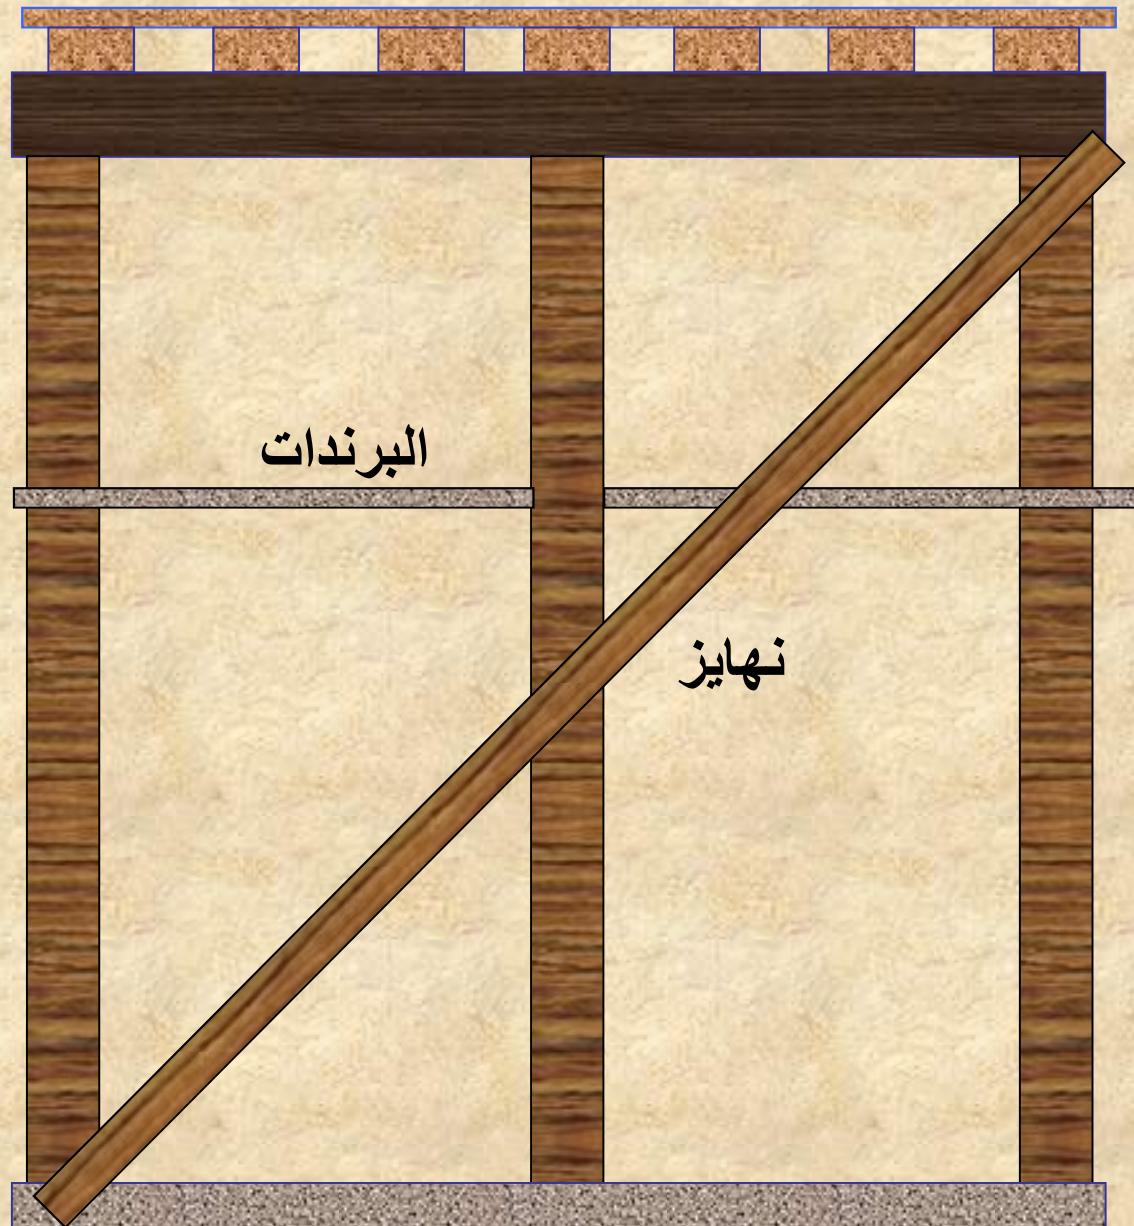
Beam and slab form. (Courtesy of American Concrete Institute)
